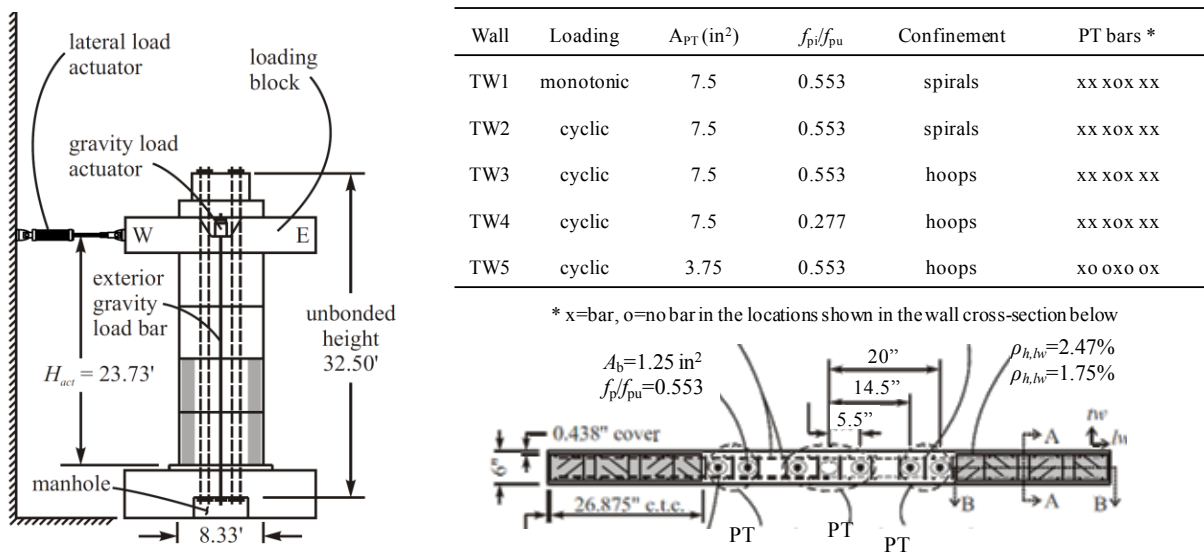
Lehigh typical test wall configuration and test wall variables (from Perez et al. 2004)
